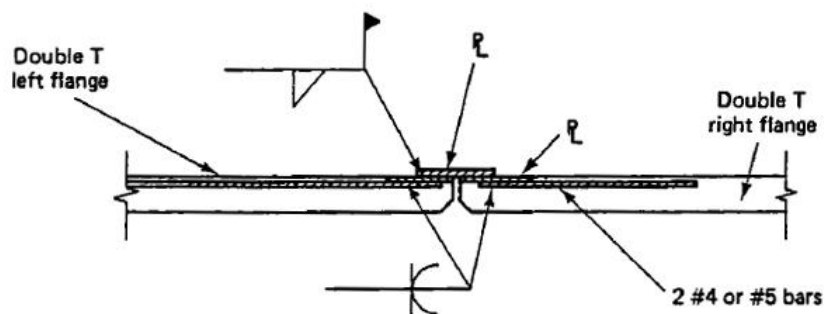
Connection of double-T flanges if no composite-action concrete topping is used.
